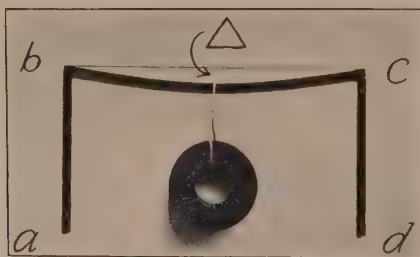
MODEL OF GIRDER ABUTMENT BRIDGE. GIRDER SIMPLY
